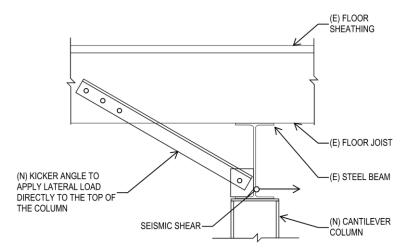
Detail illustrating how torsional forces on an existing beam can be addressed with the use of a new kicker angle.
